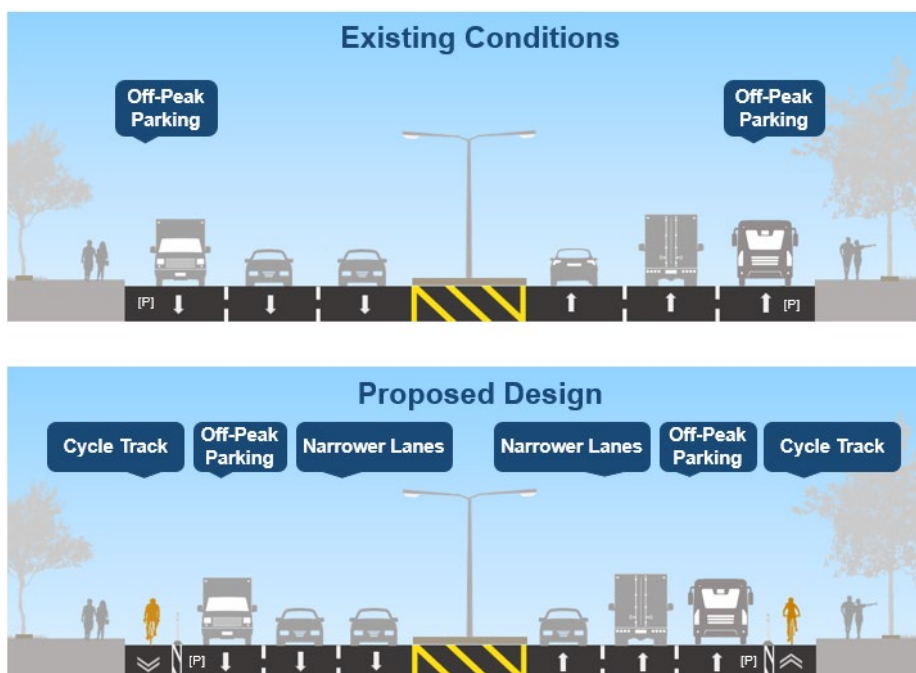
Existing and Proposed Cross-Section for Kingston Road
